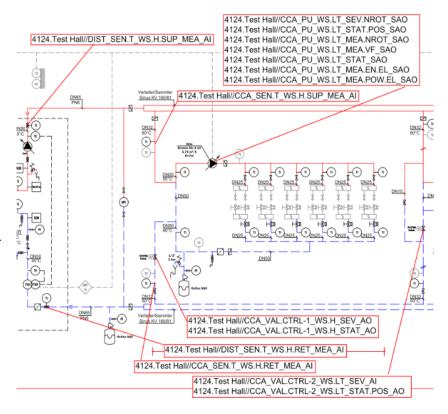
Examples of BUDO in a Concrete Core Activation of a building in construction (test hall) (source: DEERNS B.V.).
